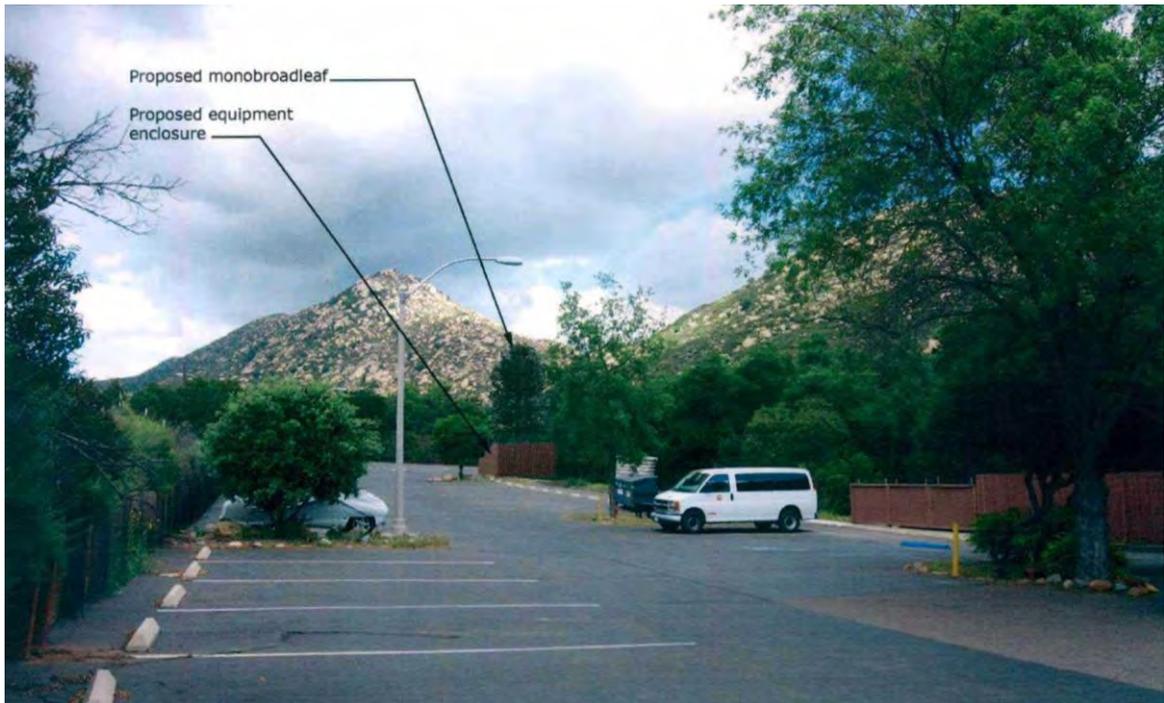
Looking northeast at the proposed mono-broadleaf tree and the cedarcrete wall enclosure
